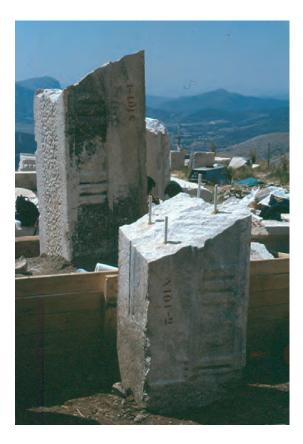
For joining the architraves, fibreglass rods were used together with the epoxy adhesive.
